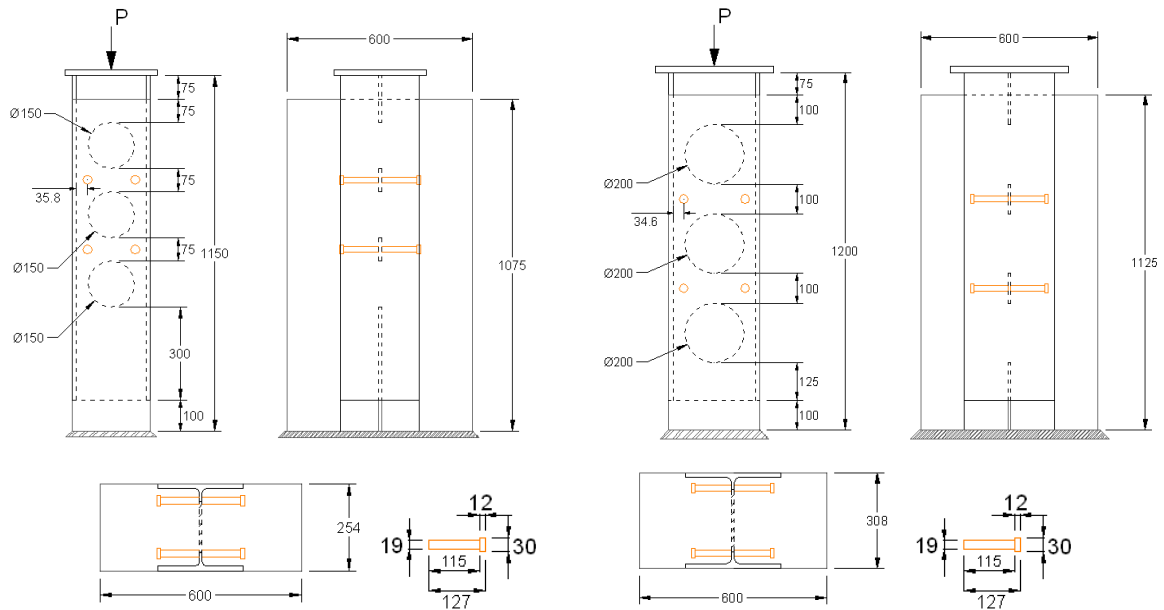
Test specimen of test group, T4, web-welded stud shear connection
